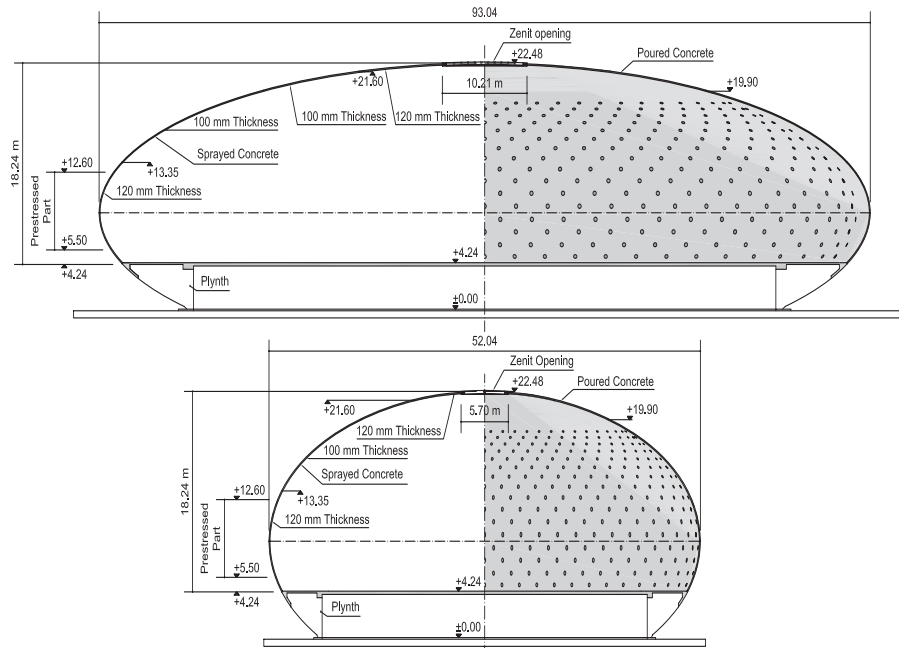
Main geometrical dimensions of the concrete shell: (a) section along long axis; (b) section along small axis (adapted from [18])
